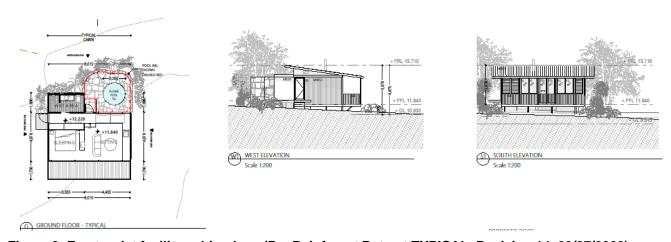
Eco tourist facility cabin plans (B – Rainforest Retreat TYPICAL, Revision 14, 29/07/2022).
